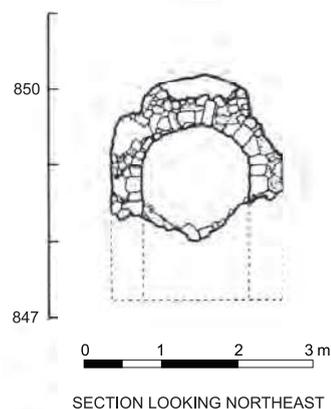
Masonry conduit inside the tunnel near Yeşilköy (E006) (1:100).
